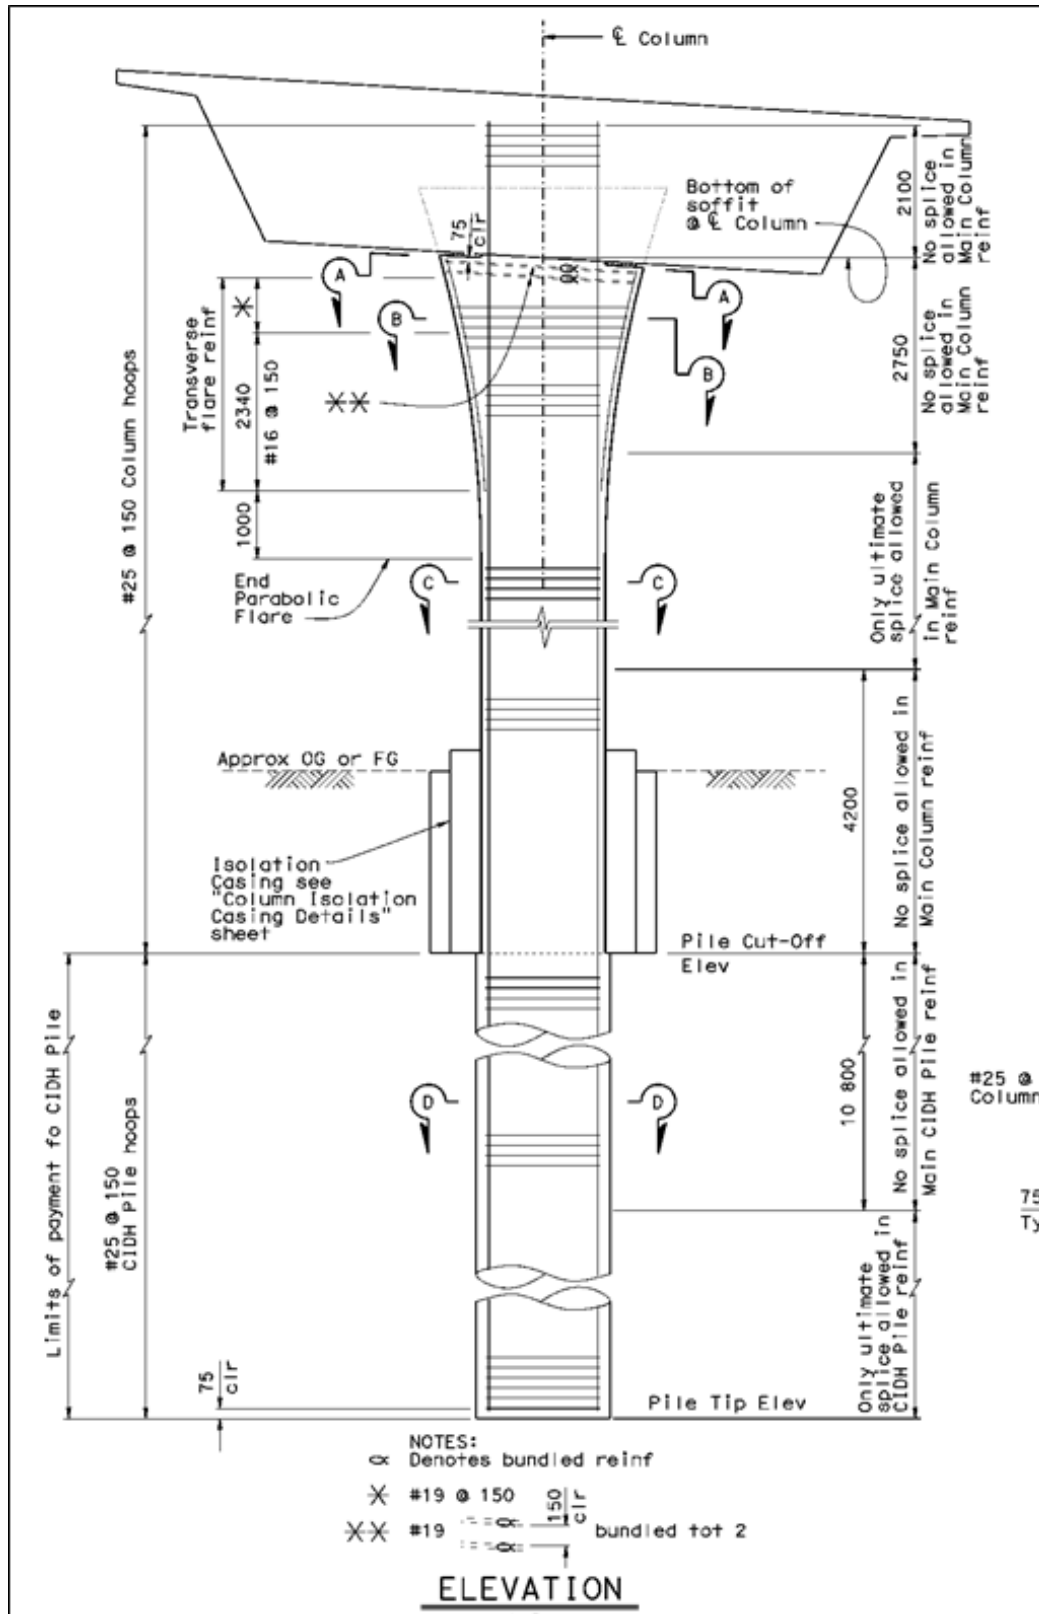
Bents 2 & 3 Column Details – 580/205 Separation, Contract No. 04-470804.
